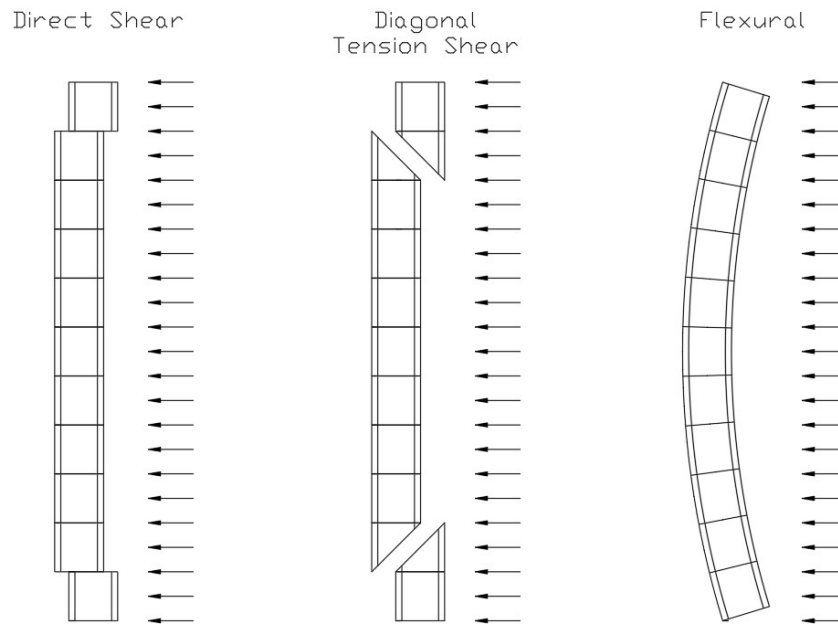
CMU Wall Failure Modes Based on Reference [6]
